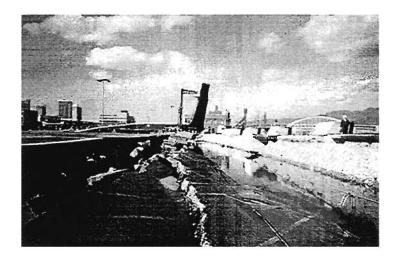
Grabens and depressions at the apron slabs behind quay walls
